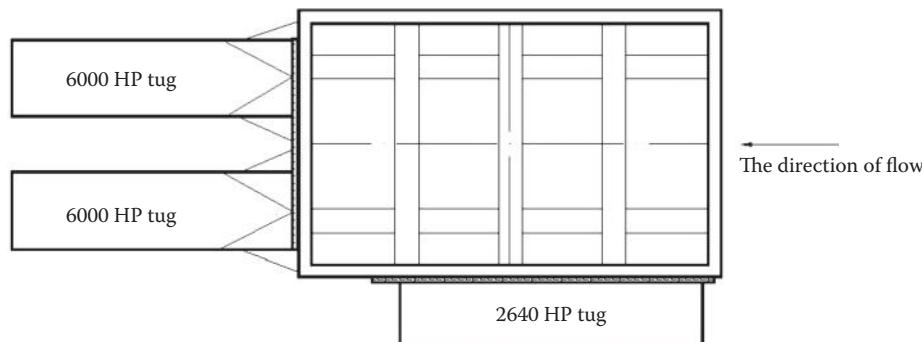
Floating transport of Pier 3 cofferdam. (From Li, J.T., & Qin, S.Q., *World Bridges*, 2, 17–19 2006.)
